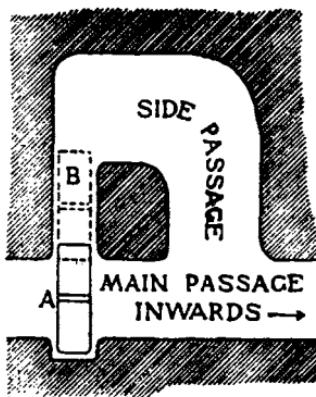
Diagrammatic Plan of Stone Door in an underground gallery in Cappadocia.
